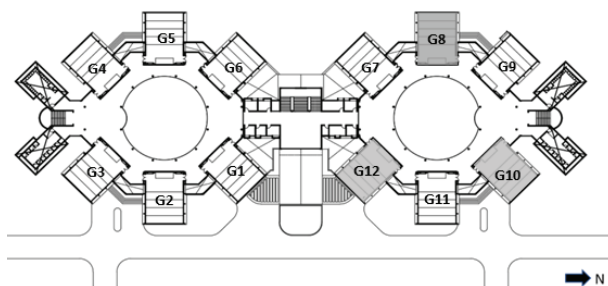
Ground Floor Plan - Lecture hall building at NIT Tiruchirappalli, India
